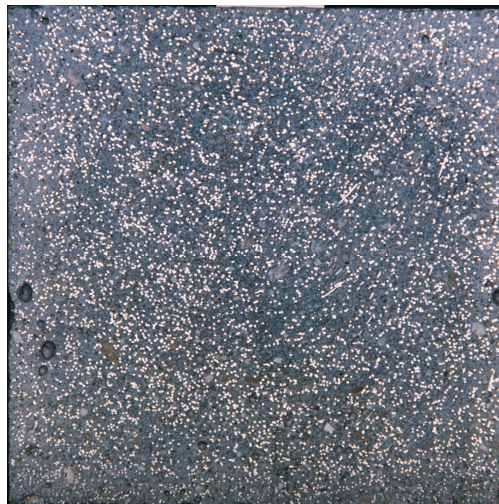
HSFRC in the hardened state, beam cross section of 125x125 mm.
